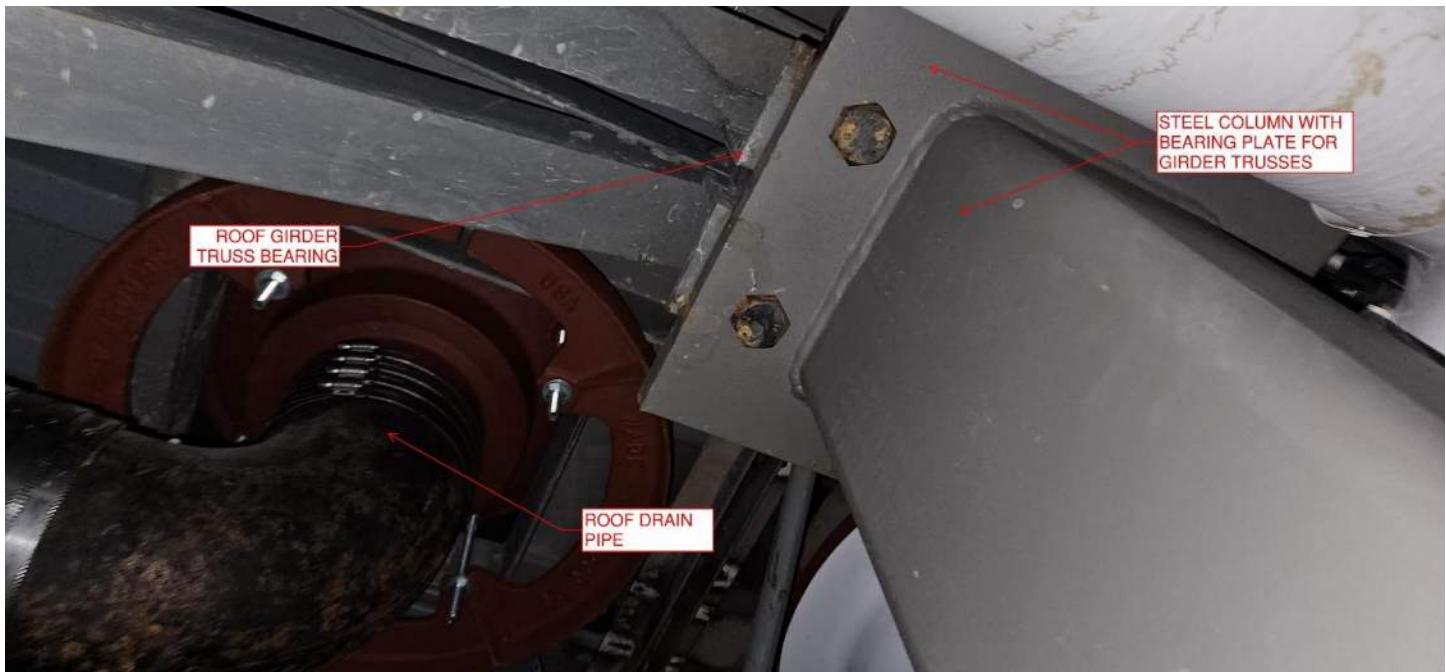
GIRDER TO COLUMN CONNECTION
